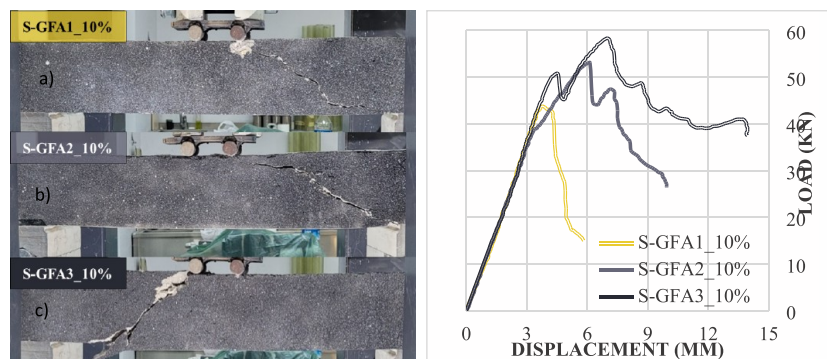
Assessment of failure patterns for 10% GFA with spacing of stirrup of (a) 270 mm, (b) 200 mm, and (c) 160 mm.
